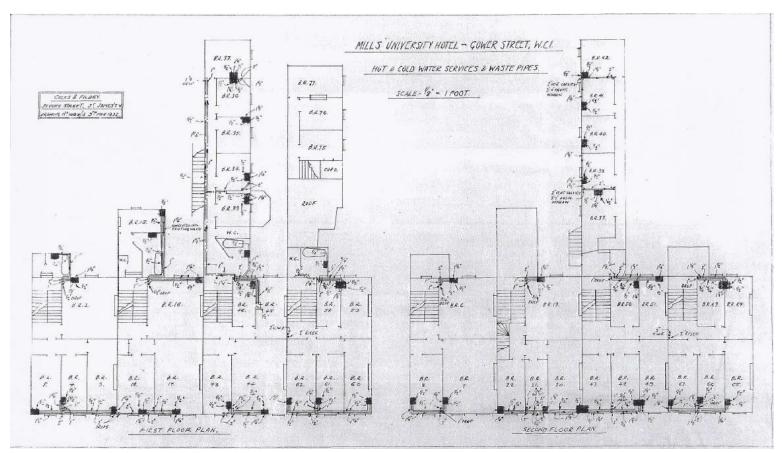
1932 Drainage Plans of Mills University Hotel (107-113 Gower Street): 1st and 2nd
